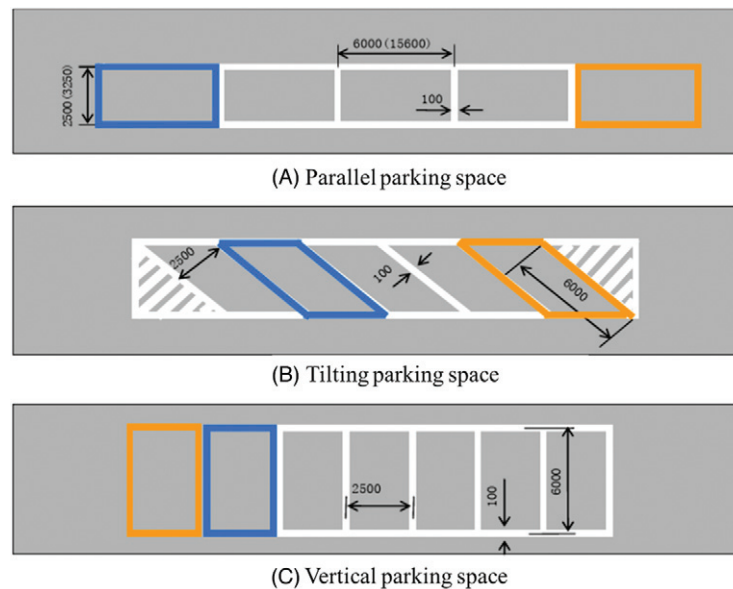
Design layout of Chinese on-street parking spaces (GA/T850-2009).
